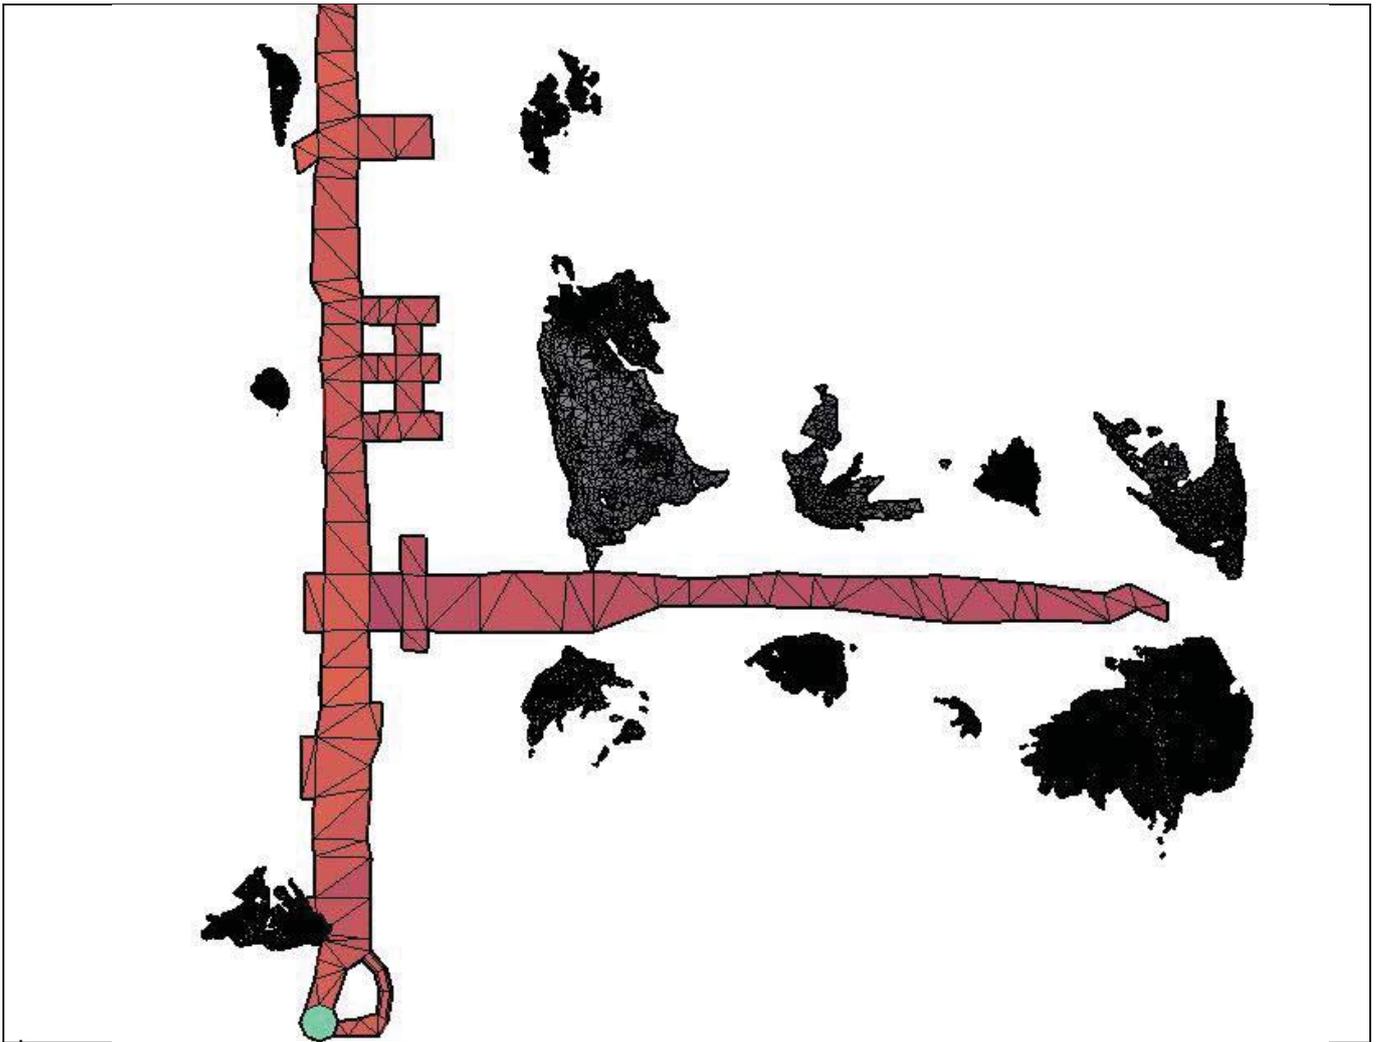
The location of post-mining voids in the area of the basic pavement in deck 510 and ramps to level 80 m.
